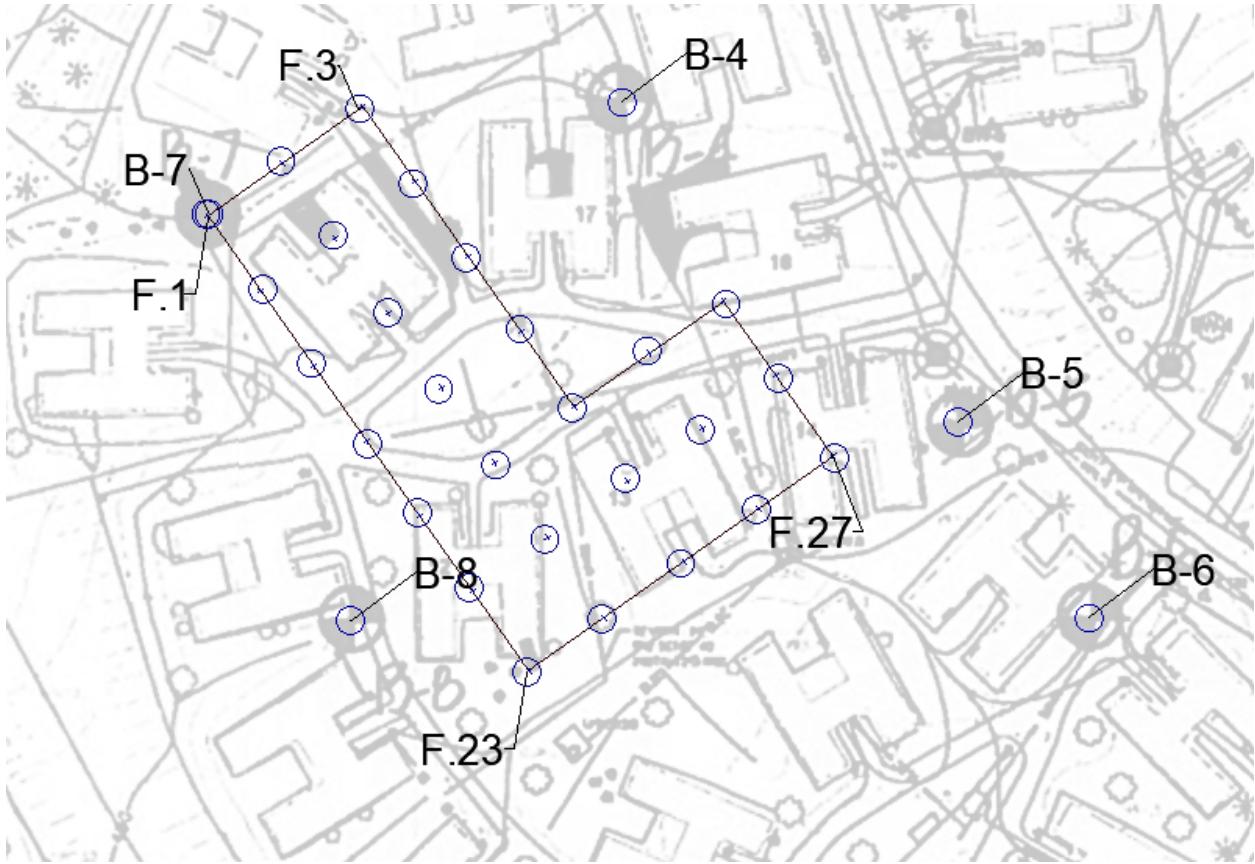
Locations of boring logs and foundations relative to the footprint of the building.
